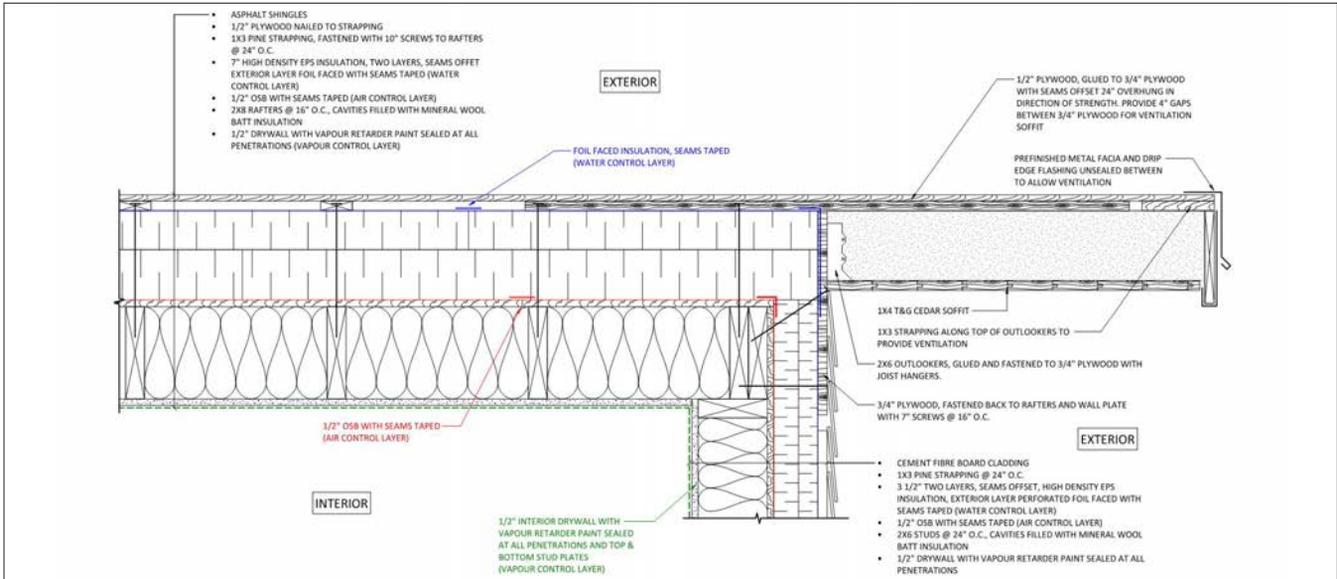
Wall-to-roof interface detail; note the continuous control layers and the exterior insulation that wraps continuously from the roof to the wall.
